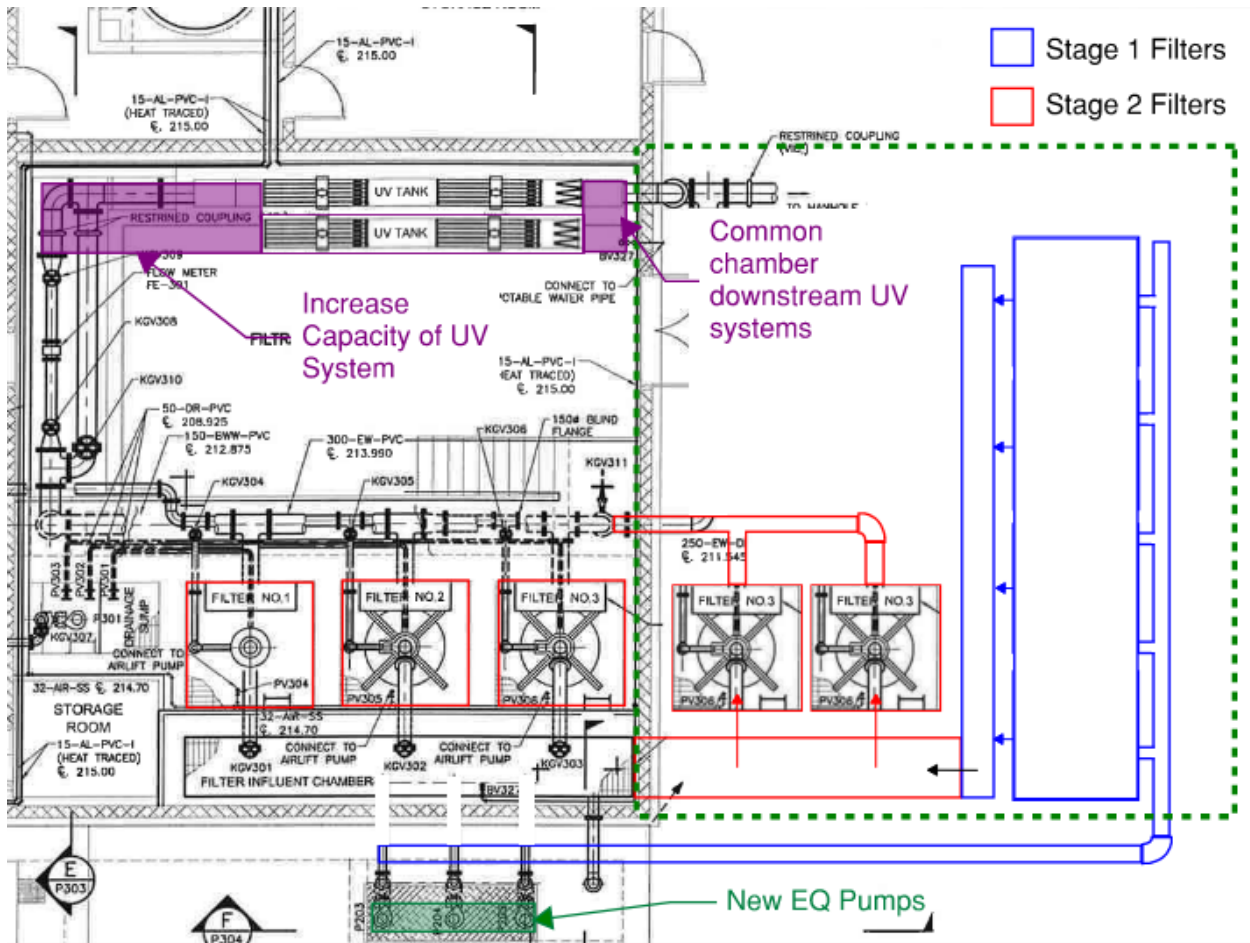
Conceptual Layout of Operation and Control Building Extension – Design Concept 1
